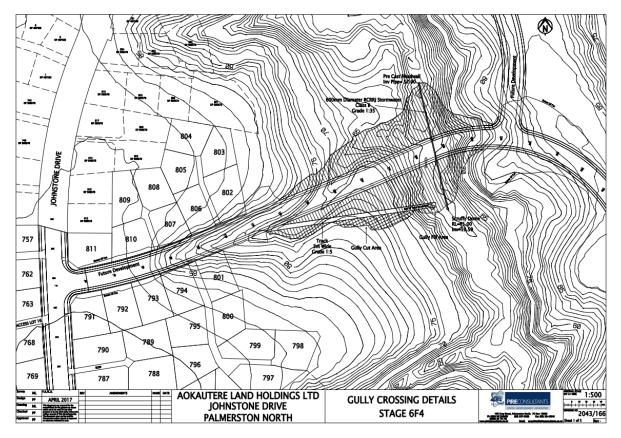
PROPOSED GULLY CROSSING GEOMETRY
